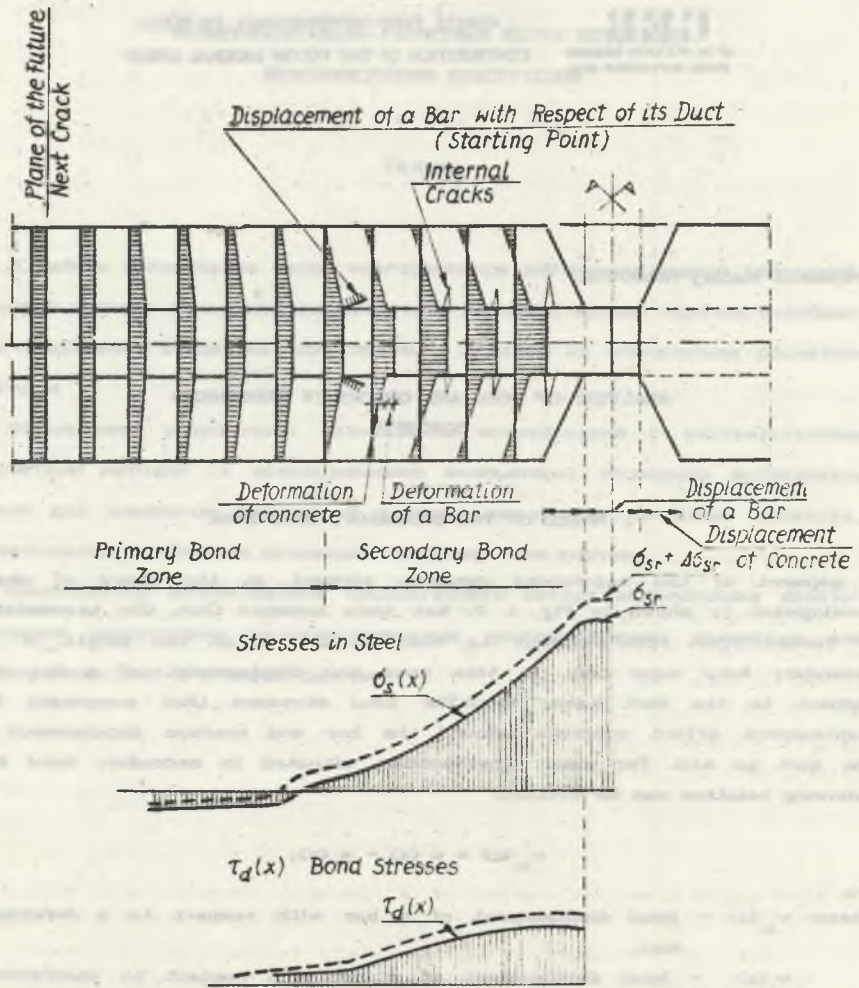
Reinforced concrete structure at the stage of cracks development.
